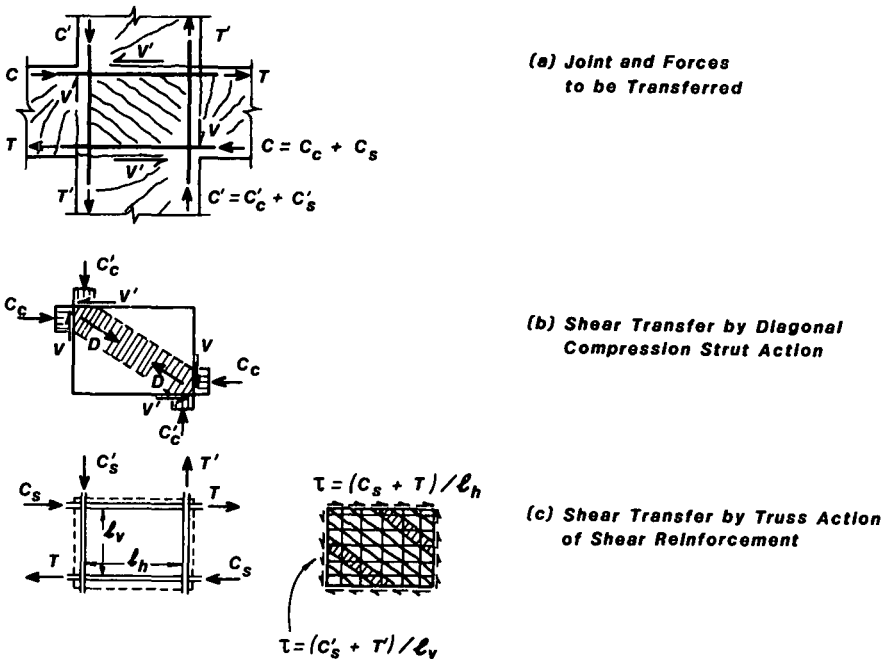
Mechanisms of Shear Transfer in a Reinforced Concrete Beam-Column Joint [7].
